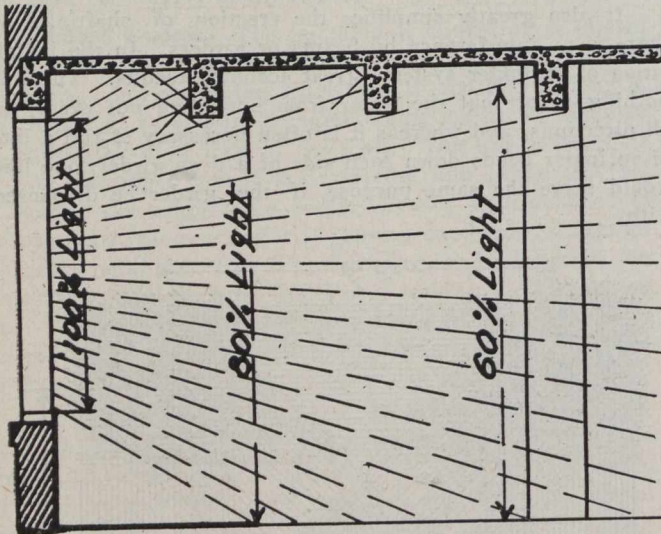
Beam and Girder System. Light Rays Reflected by Ceiling are Pocketed by Beams.
